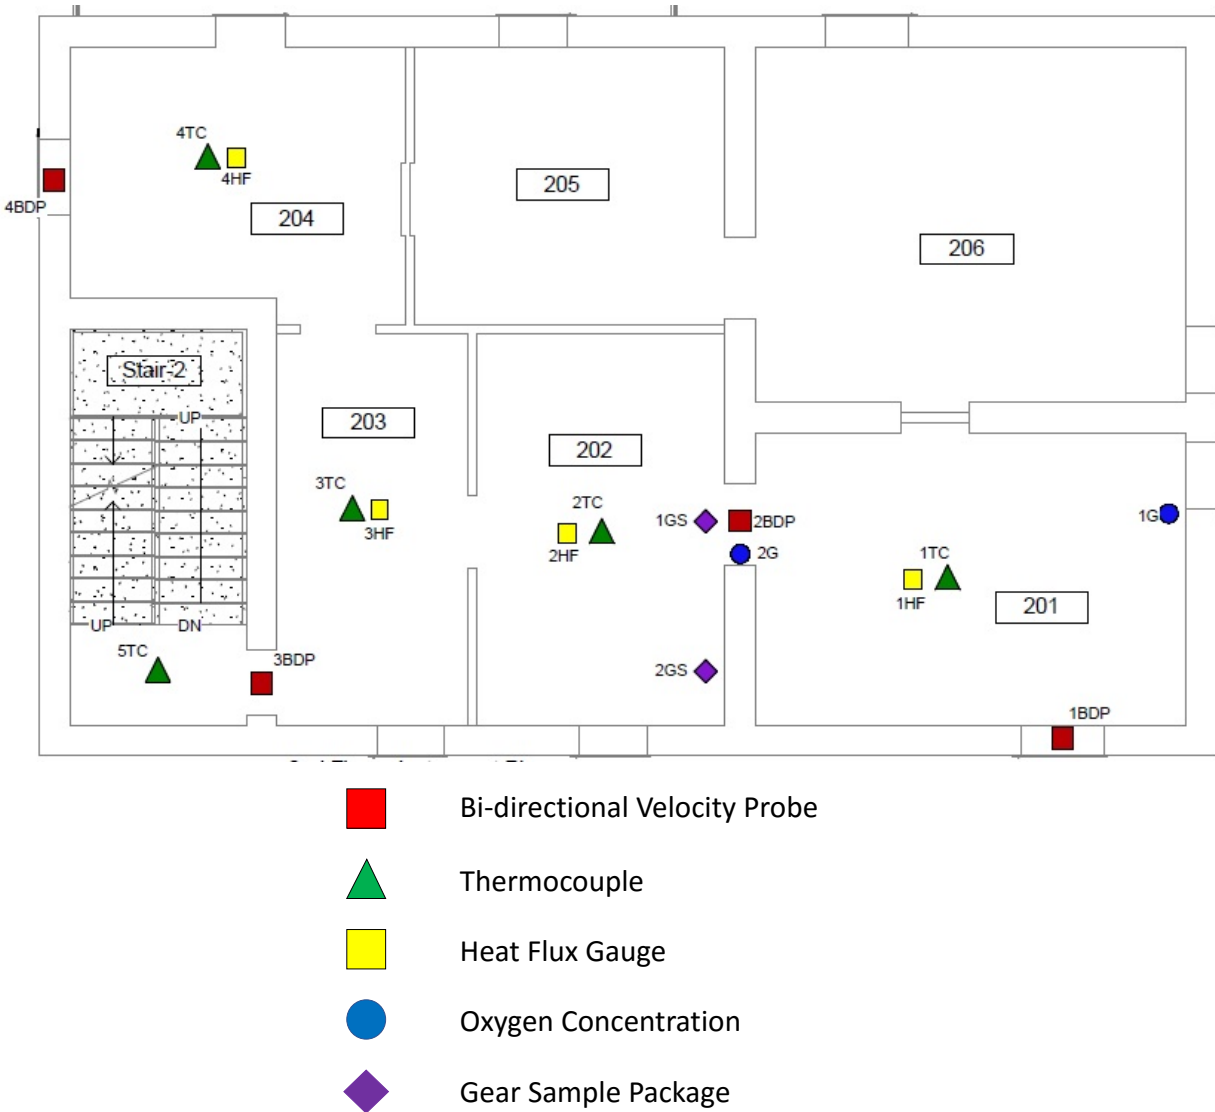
Instrument locations on second floor of concrete live fire training building
